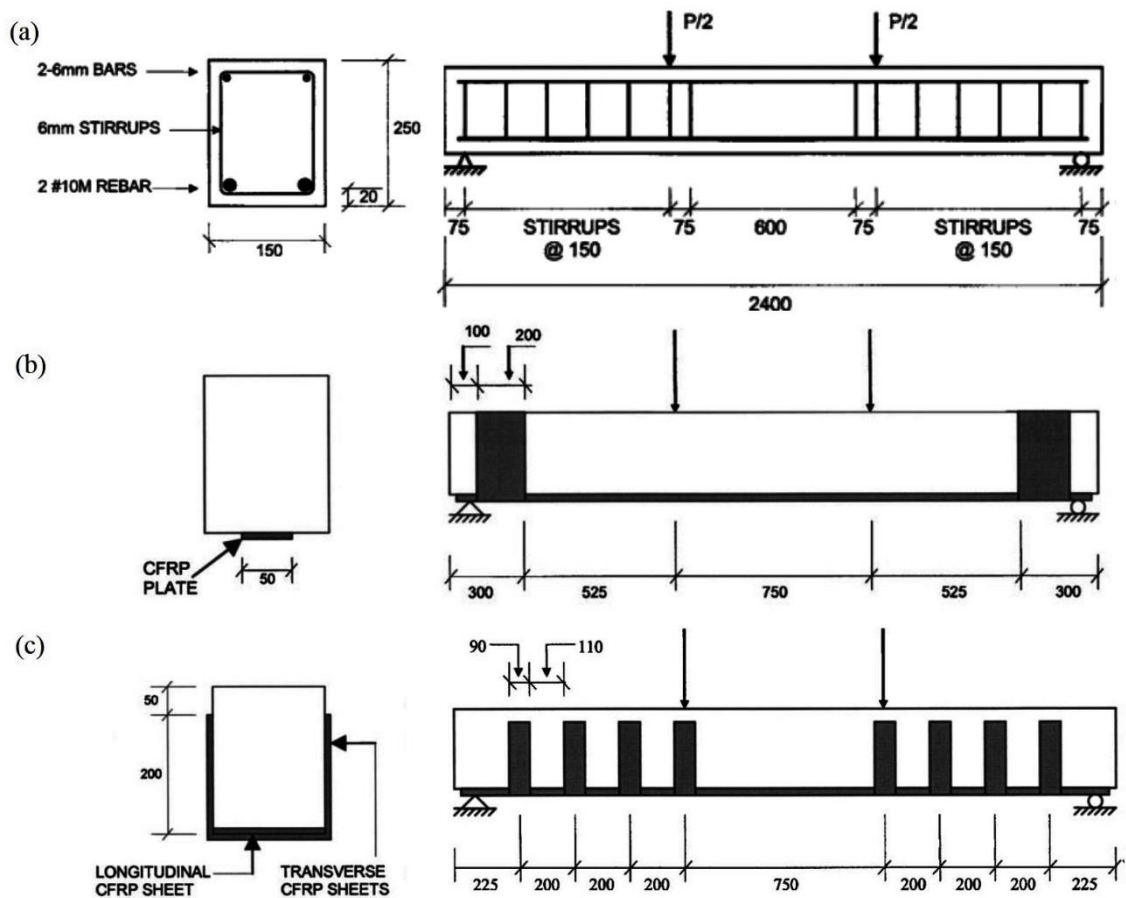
(a) Test specimen reinforcement configuration, (b) CFRP strengthening Scheme I and (c) CFRP strengthening Scheme II (Soudki, et al., 2007)
